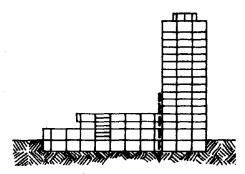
Office tower seismically separated from parking structure building, Kajima International Building, Los Angeles. Solutions to the setback configuration are analogous to those of its horizontal counterpart, the re-entrant corner plan. The first type of solution consists of a complete seismic separation in plan, so that the portions of the building are free to react in their own way (Figure VII-16). For this solution, the guidelines for seismic separation discussed in the previous chapter, should be followed.
